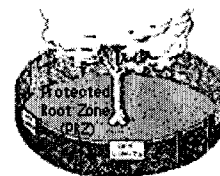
Put up fences and signs around trees you want to save to alert construction workers to damage potential.
